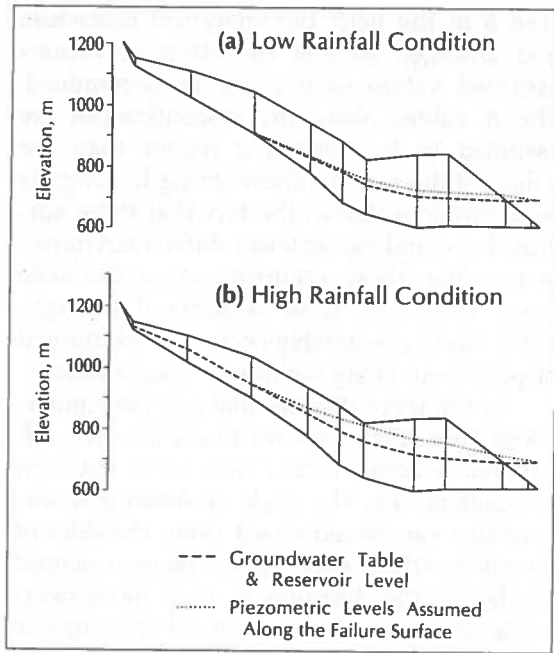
Piezometric levels used in stability analyses for Section 2, at a reservoir elevation of 710 m.
